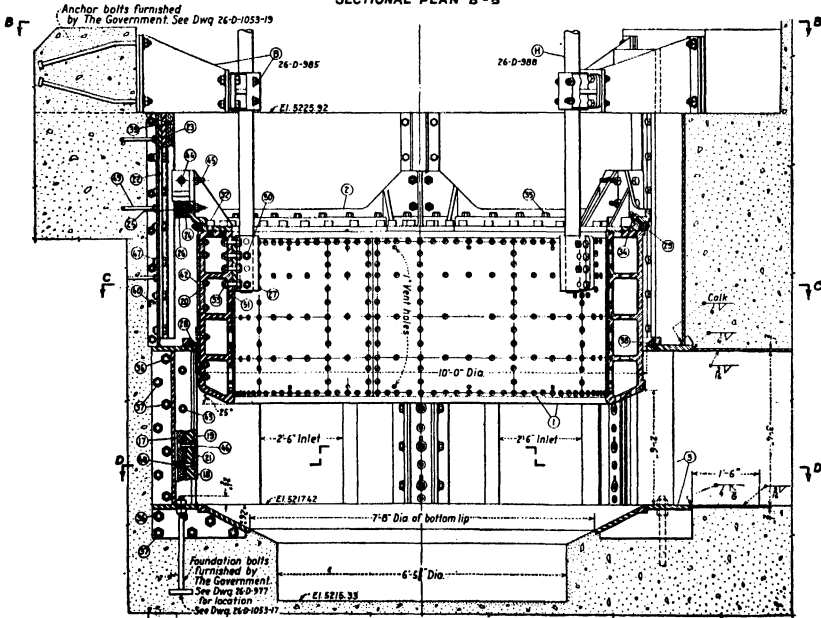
Ten-foot cylinder-gate and hoist installation controlling Shoshone Canyon conduit.
